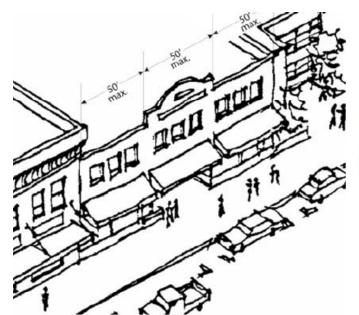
(4)(b). Apartment building articulation diagram.
